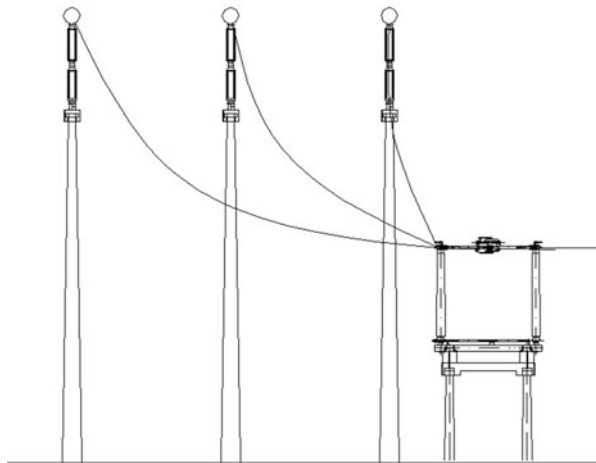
Rigid busbar with flexible connection: elevation drawing (Carlos 1991)
